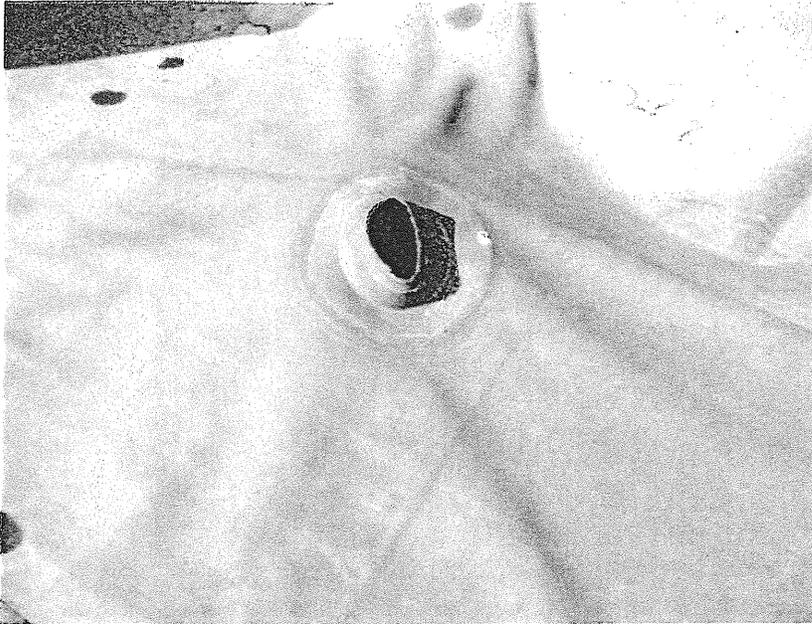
Partial view of EPDM membrane roofing at the six-story portion of the building showing the membrane detached from a plumbing vent.
